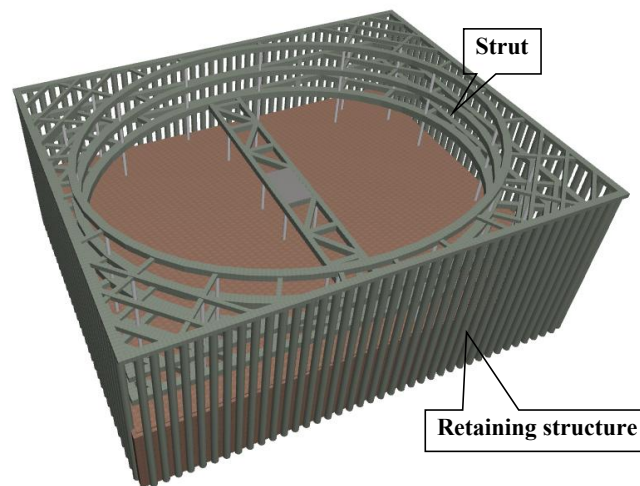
Building Information Model Of Pile-Strut Bracing Structure Of The Excavation
